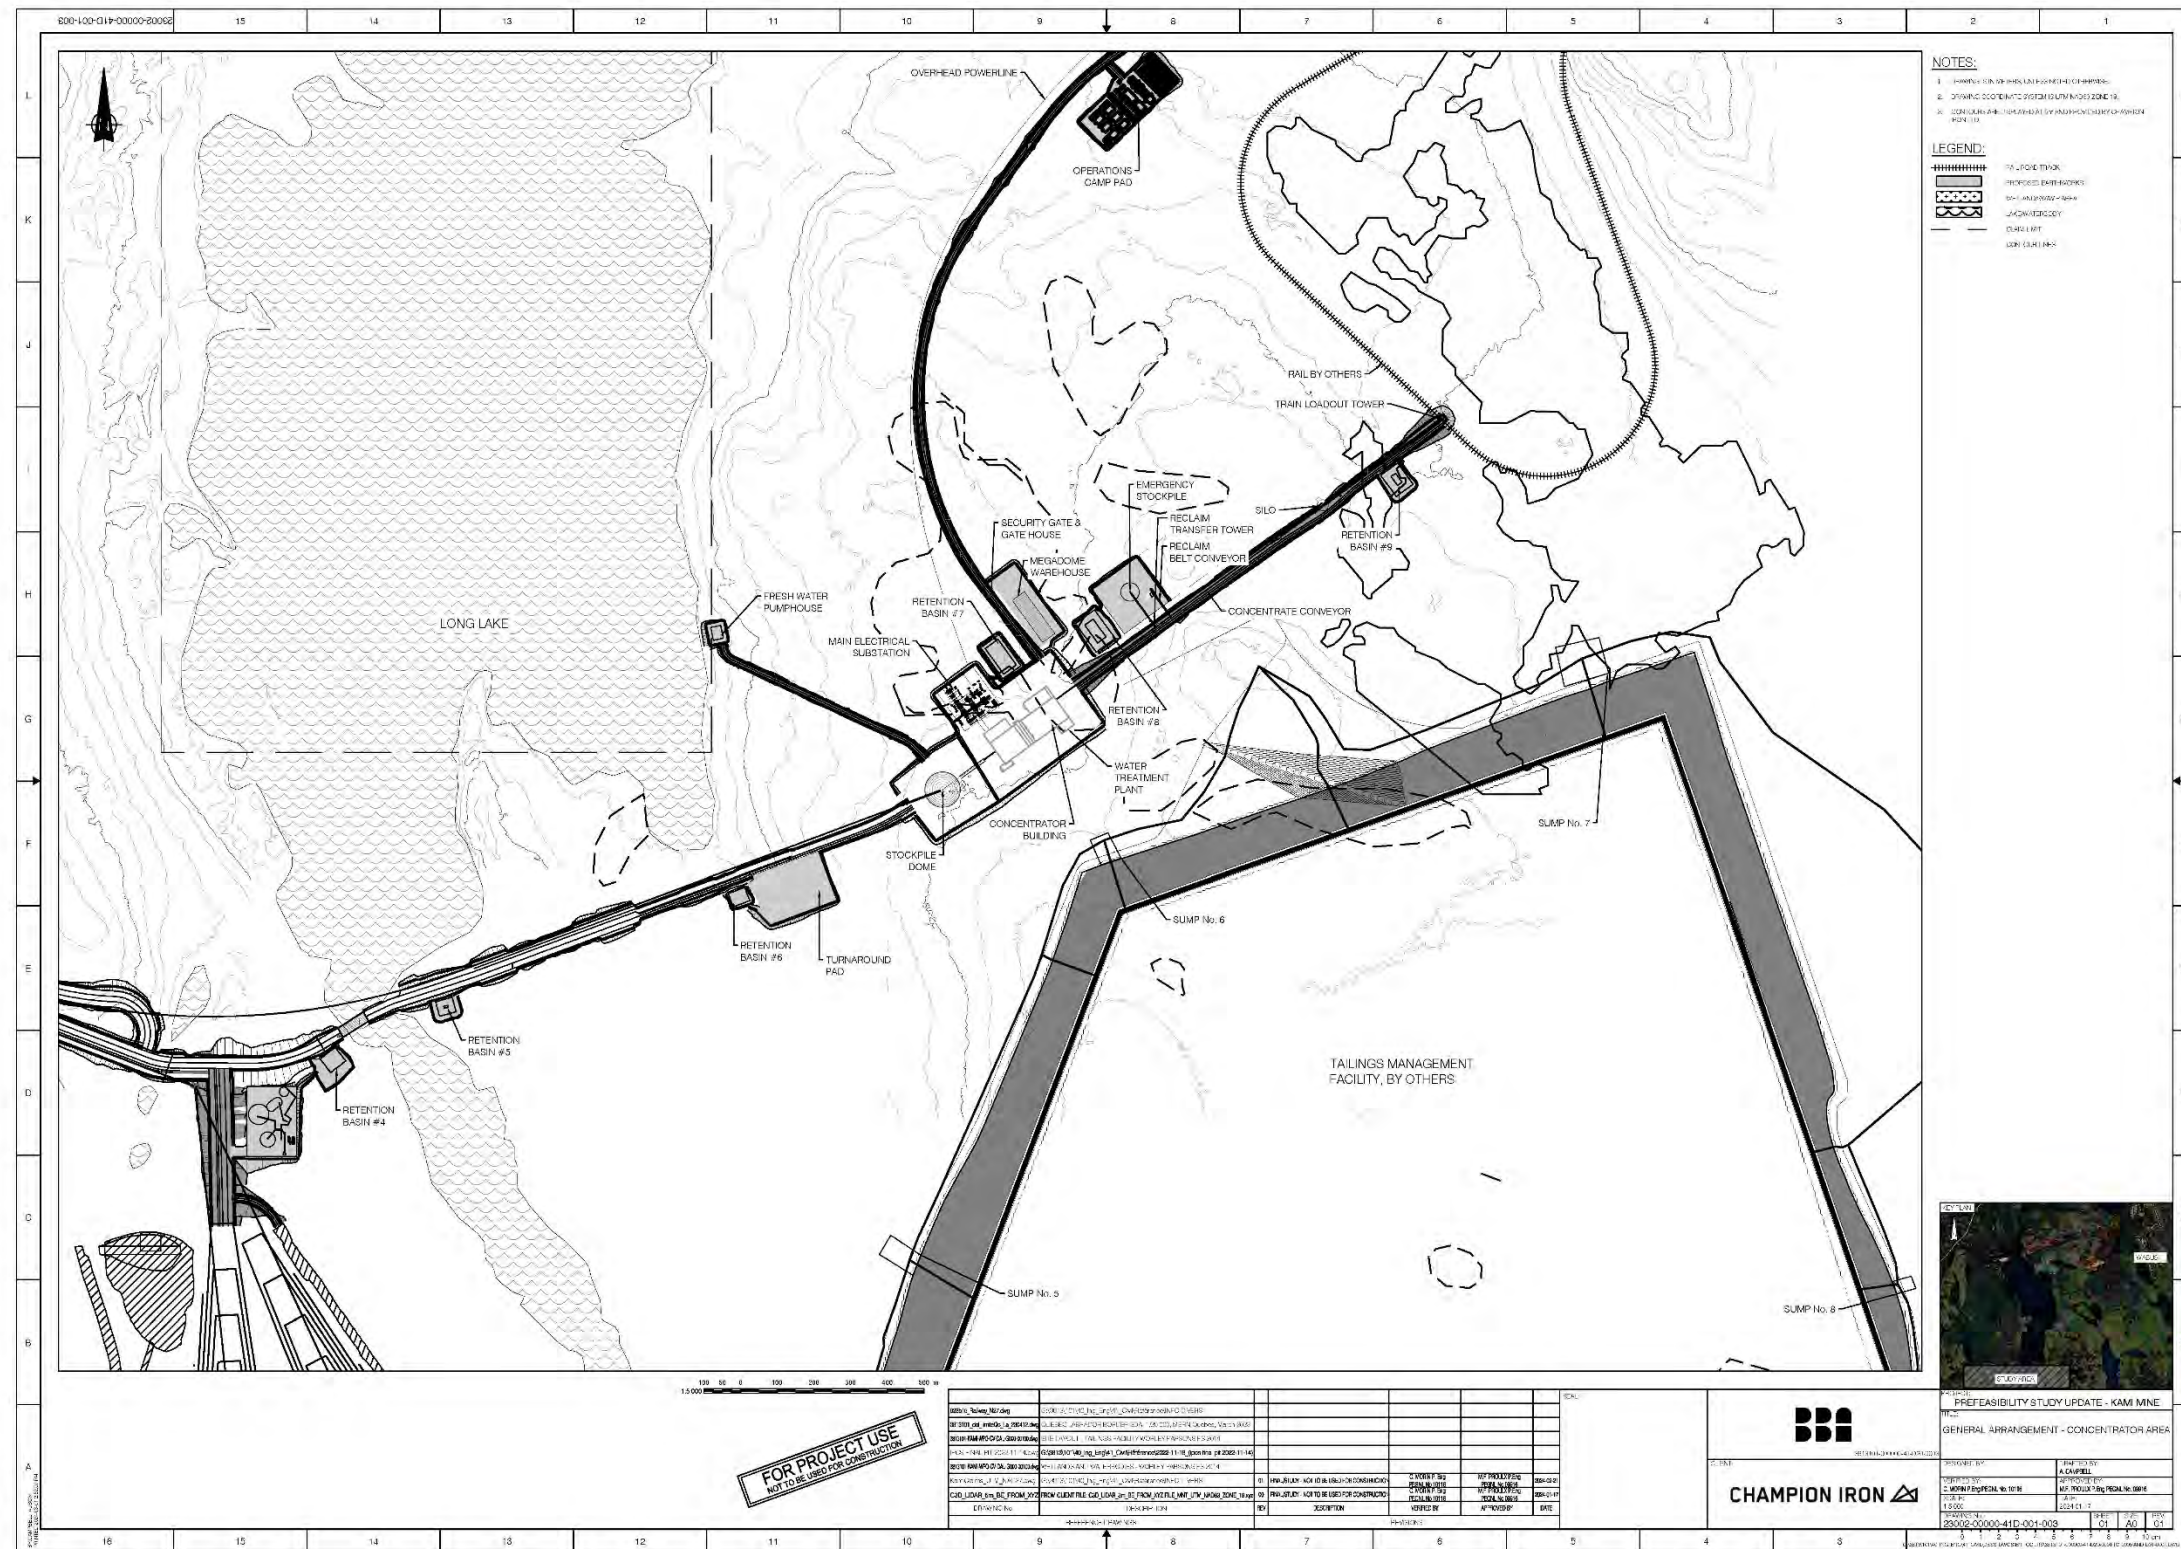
Site Plan Kami Iron Ore Project (Zoom on Kami Site Infrastructure - East)
